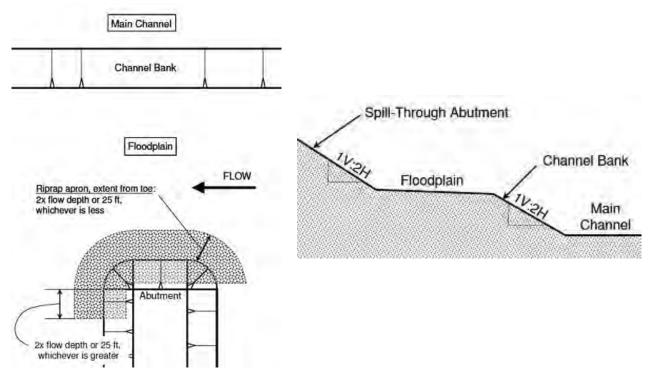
Plan view of the extent of rock riprap apron
